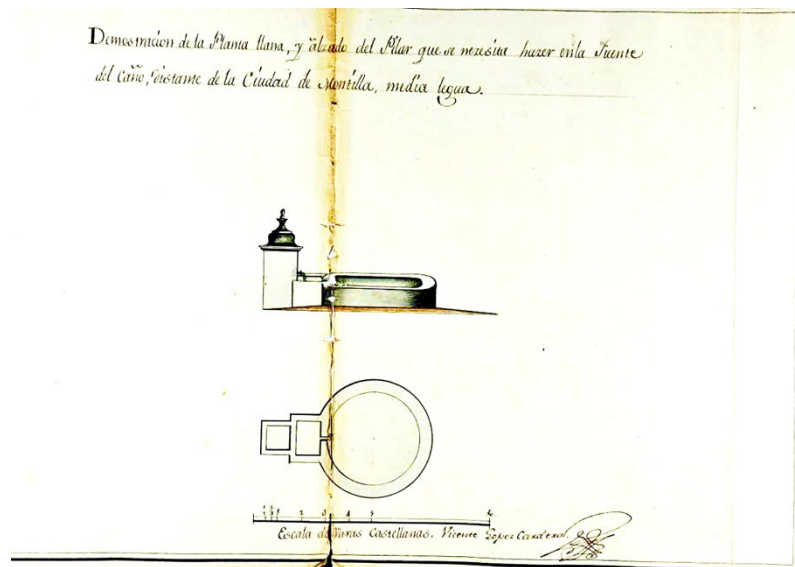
El Caño fountain: plan for the execution of the construction work on this fountain [62].
